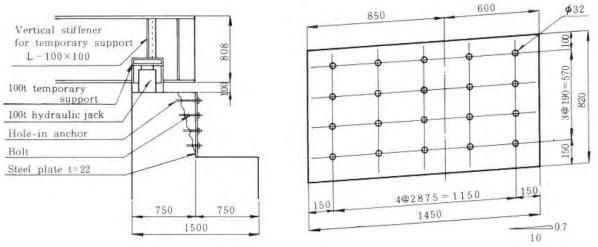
Steel plate for reinforcement of pier plinth
